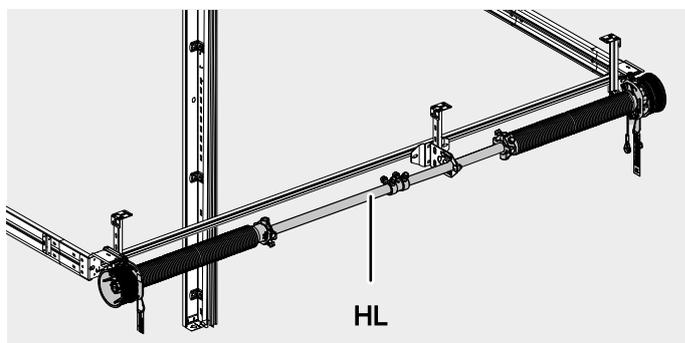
Rear-mounted torsion spring shaft (HL version)
